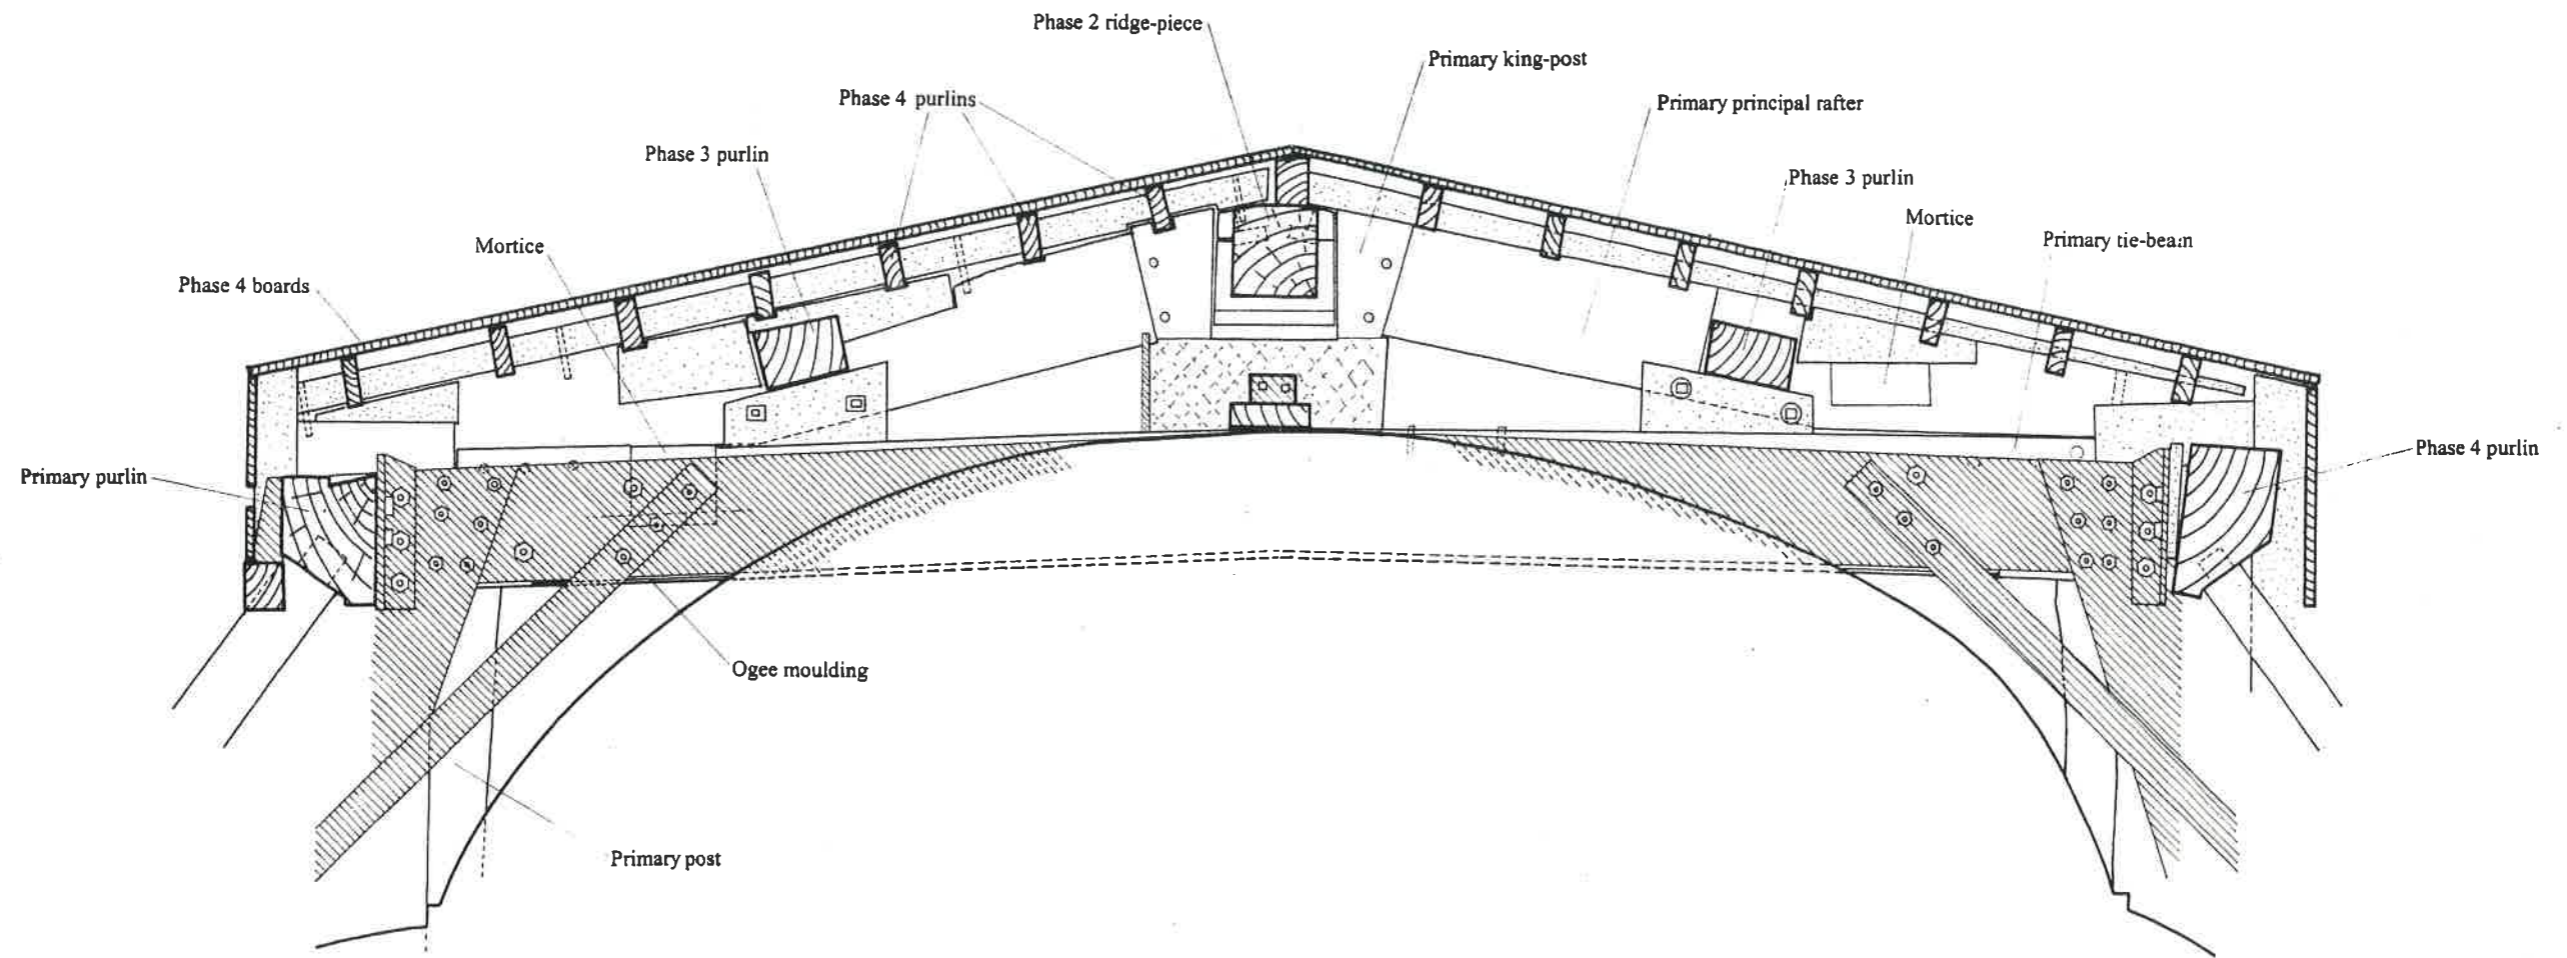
Roof truss 3 east face (HM Office of Works May 1922)
